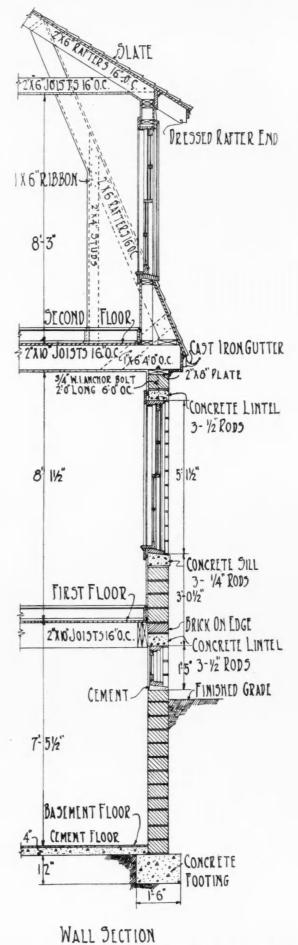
Section of Cottage Row Wall Thru Second Story Dormer.
